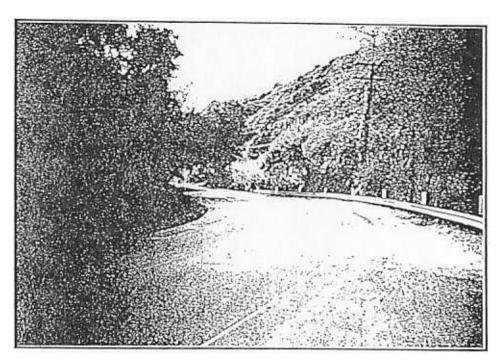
The Topanga Pipeline Investigation. View to the south from UTM location Zone 11, 352780 meters Easting, 3774582 meters Northing showing retaining wall (left) and guard rail adjacent to Topanga Canyon Boulevard.
